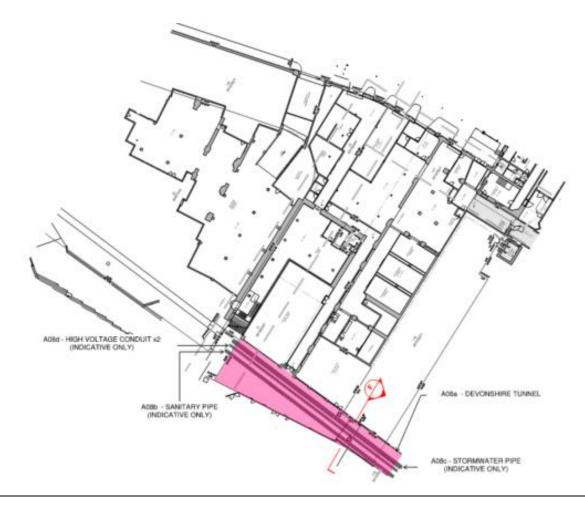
Plan View of Devonshire Street Tunnel and Sewer Piper Below
